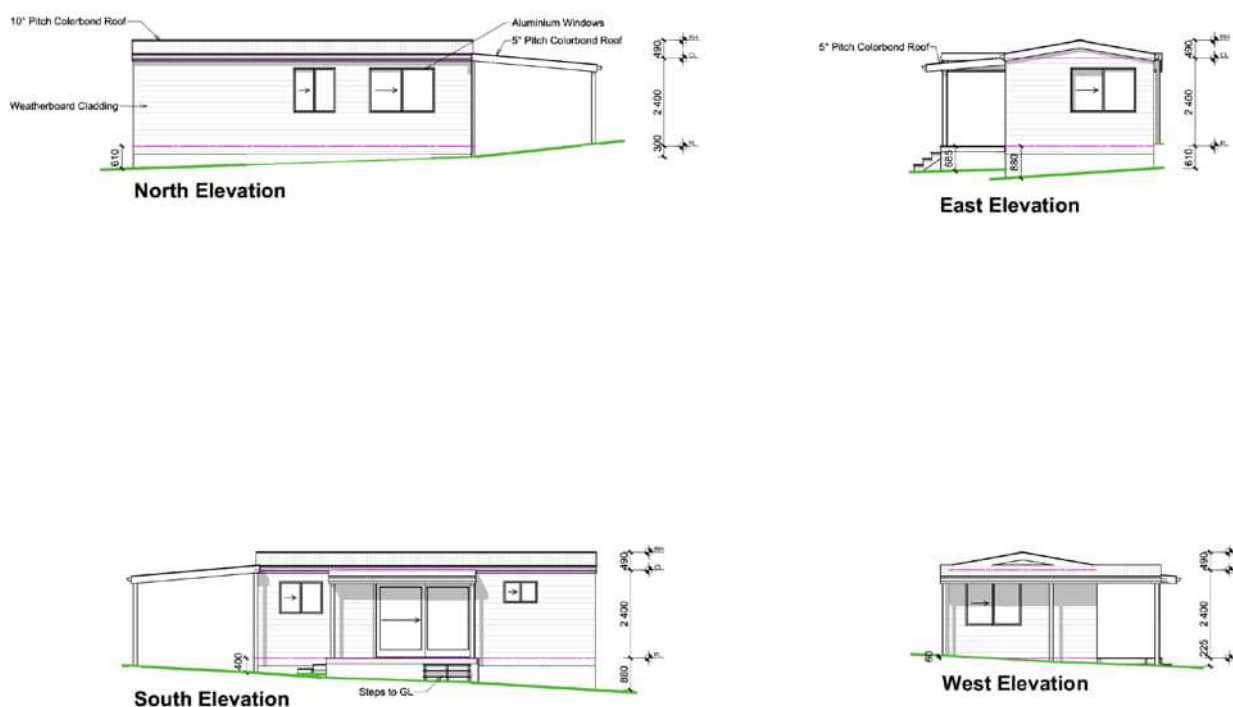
SSD Elevations has a straightforward design with a simple roof.
